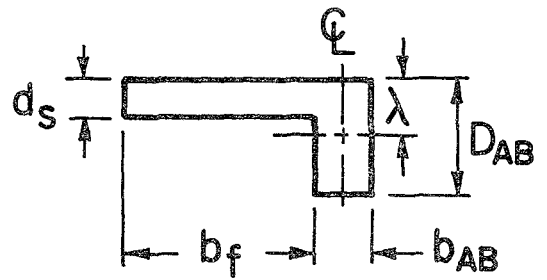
Model of Single-Panel, Single-Story Structure Based on ACI 318-71, Section 8.7
